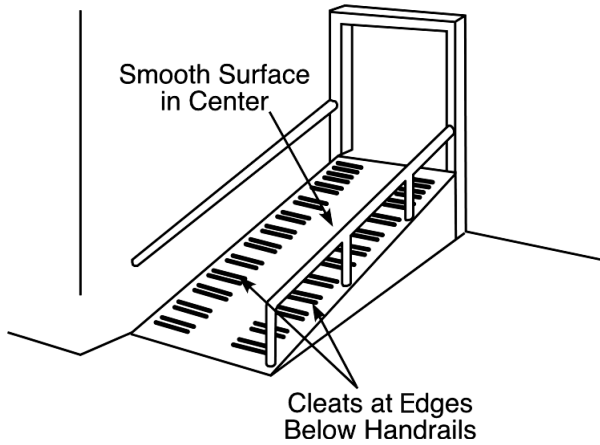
Ramp Design for Pedestrian and Vehicular Traffic (adapted from Thomson et al. 1963)
